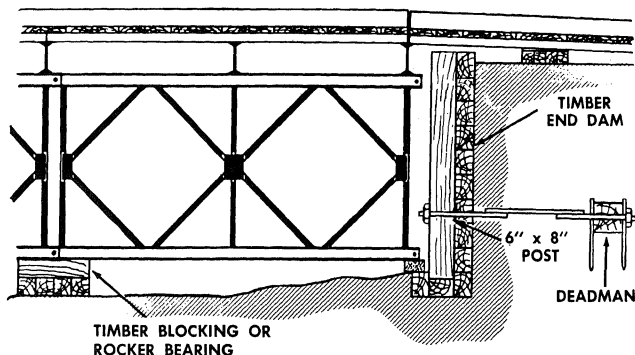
End bearings for deck type panel bridges, without end posts. Last bay is cantilevered over the timber or rocker bearings.
